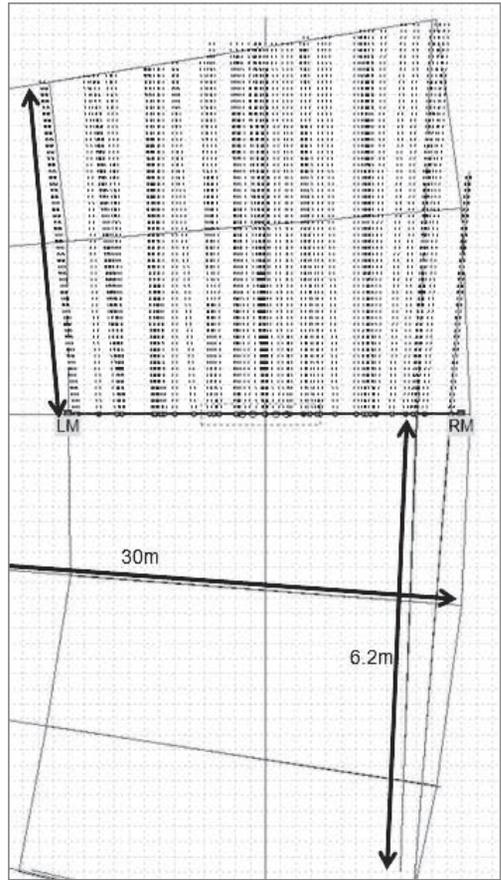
Plan of a 5.2 m decline turning left on a 30 m radius of curvature.
